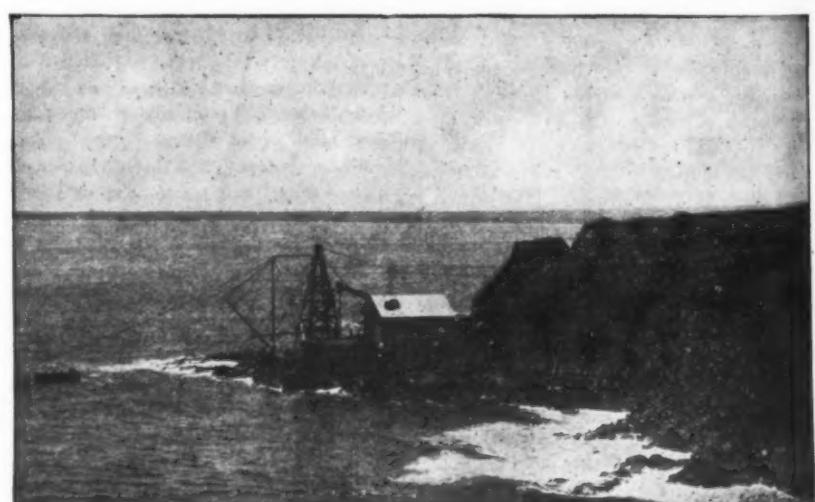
LIDGERWOOD CABLEWAY, HILO, HAWAII—TAIL TOWER, WAREHOUSE, WHARF AND DERRICKS.
